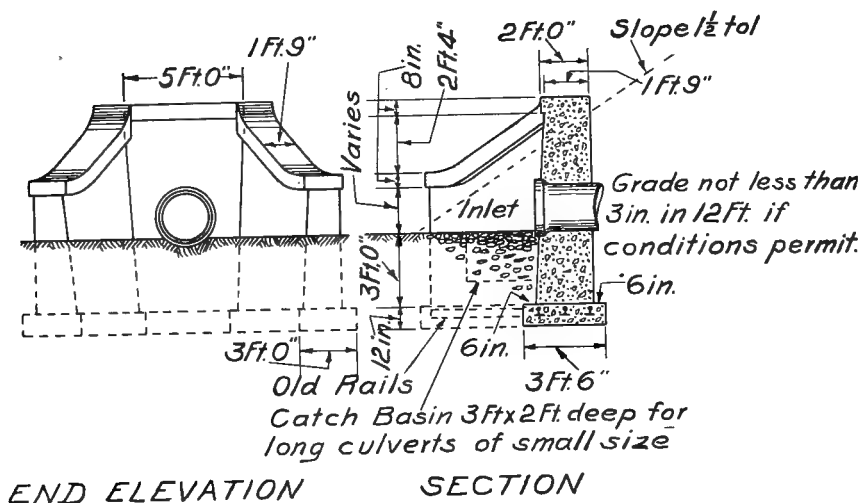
STANDARD PIPE CULVERT, WING TYPE, N. Y. C. & H. R. R. R.
